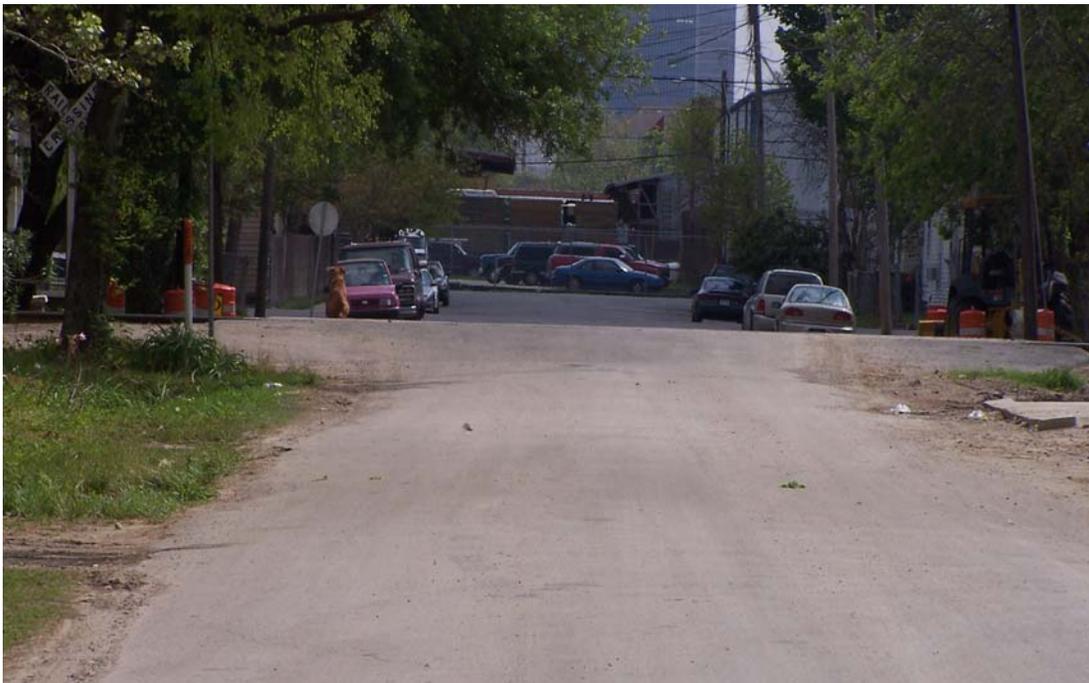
Terminal Subdivision at Johnson St (looking south)
